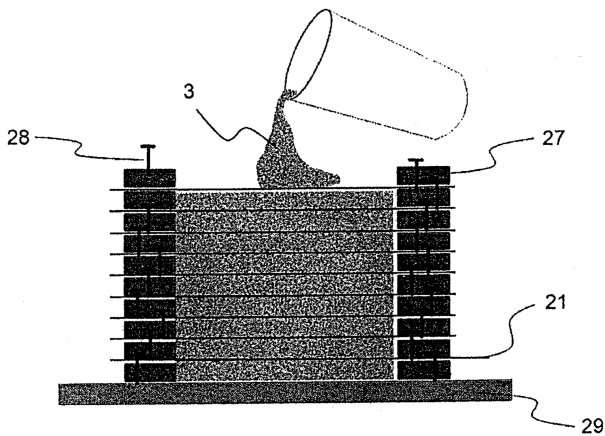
Manufacturing transparent concrete (<http://theconstructor.org/concrete>)
